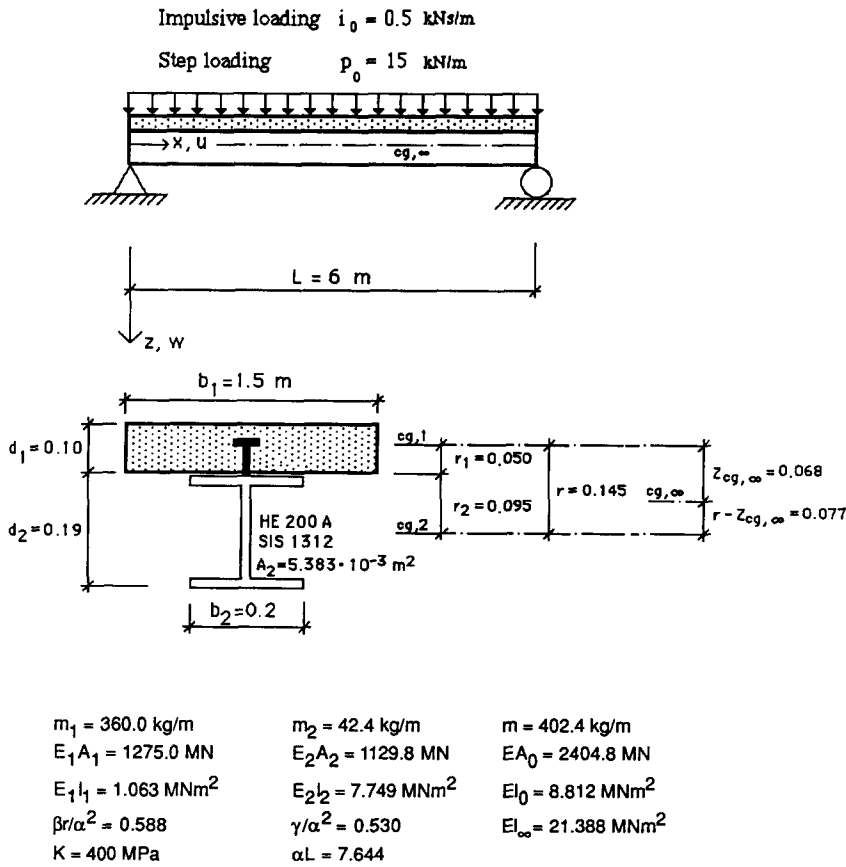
Simply-supported composite beam of concrete and steel subject to impulsive and step loading, respectively.
